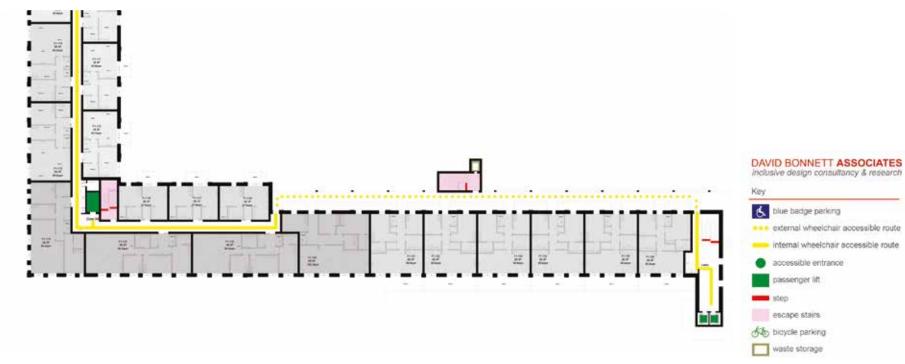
Block F1 General Arrangement - Fourth floor
